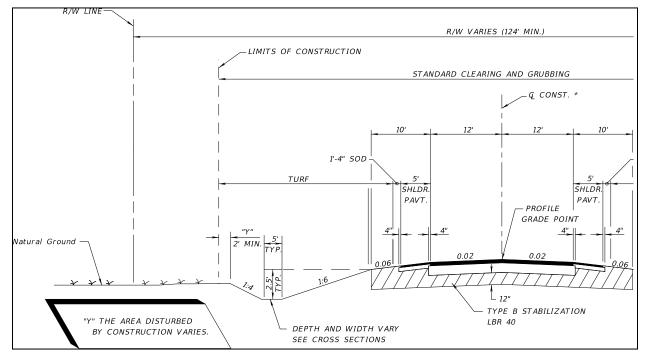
Typical Ditch for Two-Lane Rural Roadway
